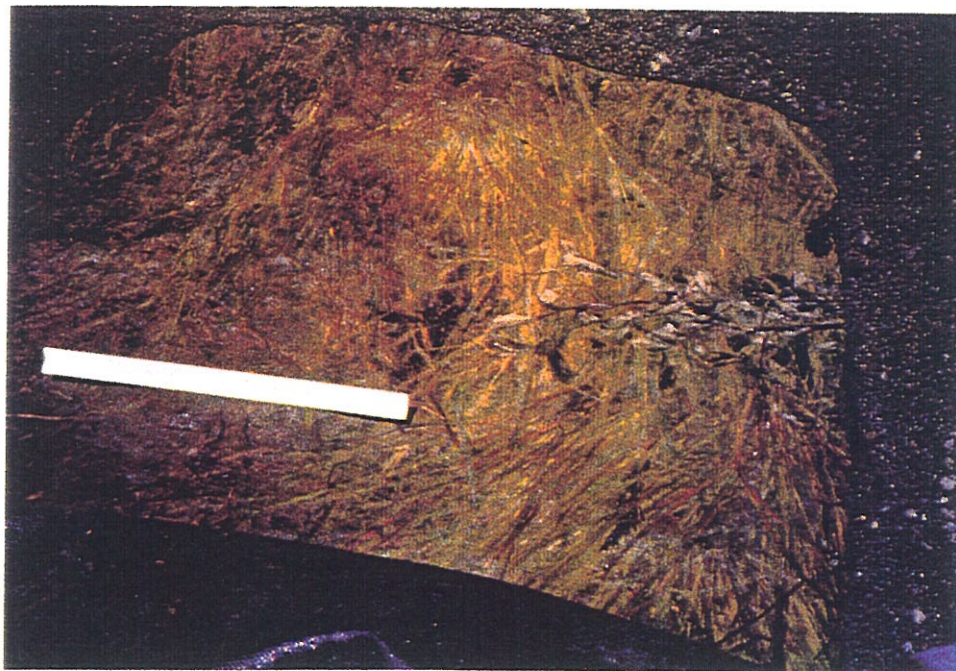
Geotextile folded back and an organic mat exposed overlying the silty subgrade.
